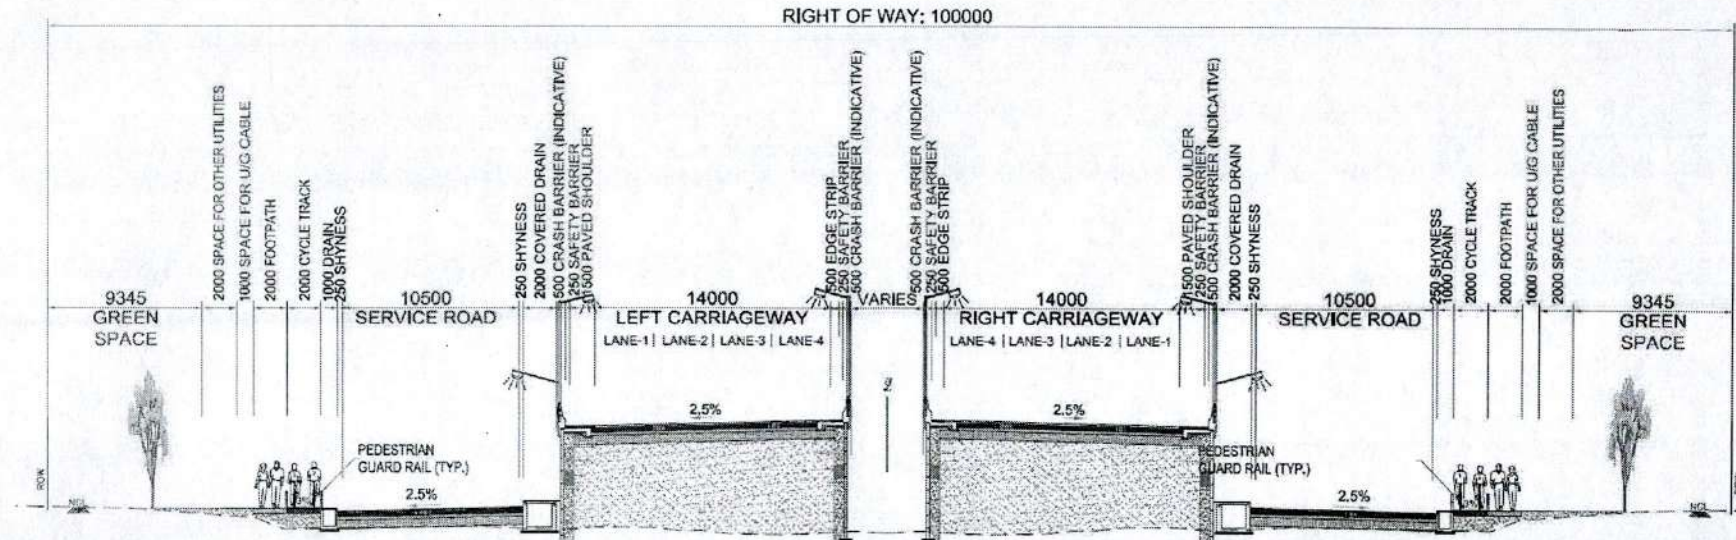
Typical cross section at Tumakuru Road Flyover Approach Location
